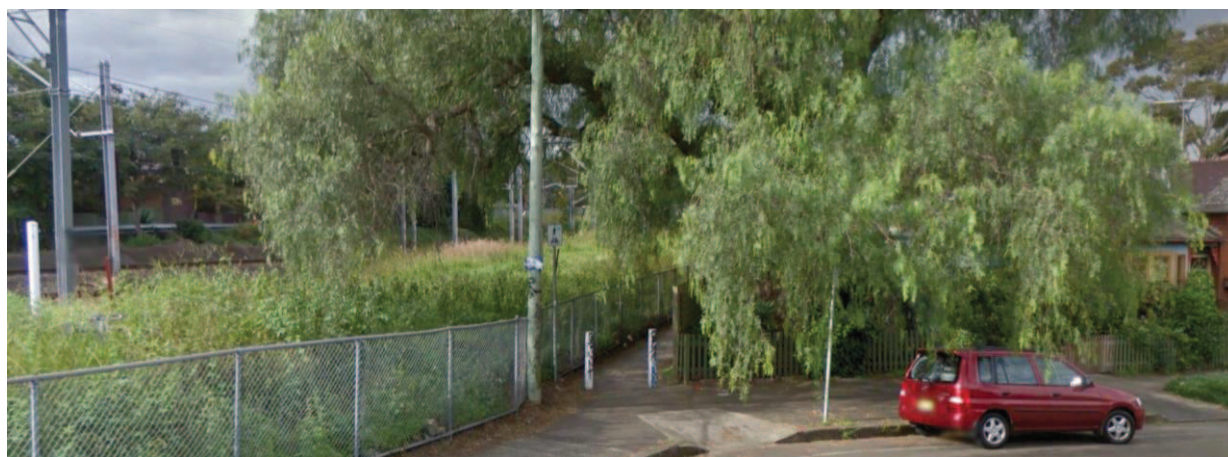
Shared path between School Parade and Kays Avenue East. Proposed widening of existing path to 2.5 metres.
